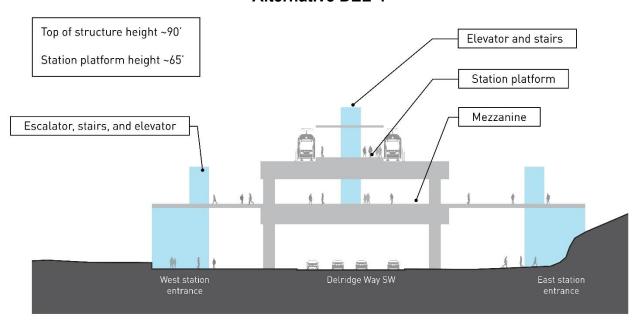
Delridge Station Cross Section for Alternative DEL-3 and Alternative DEL-4
